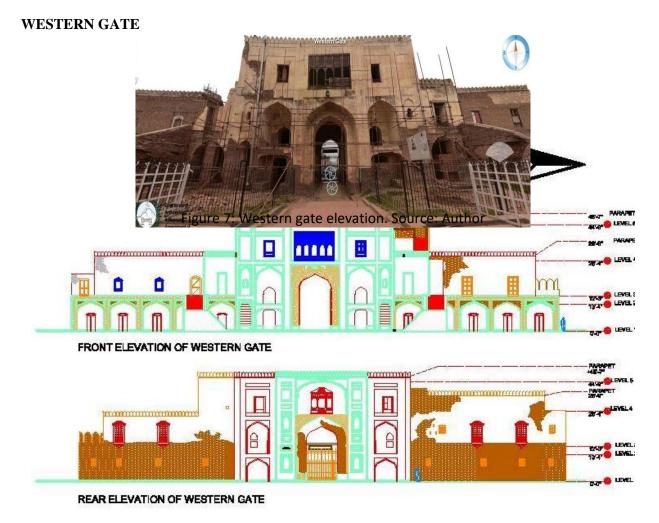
Elevation and plan of Western Gate<sup>7</sup>
